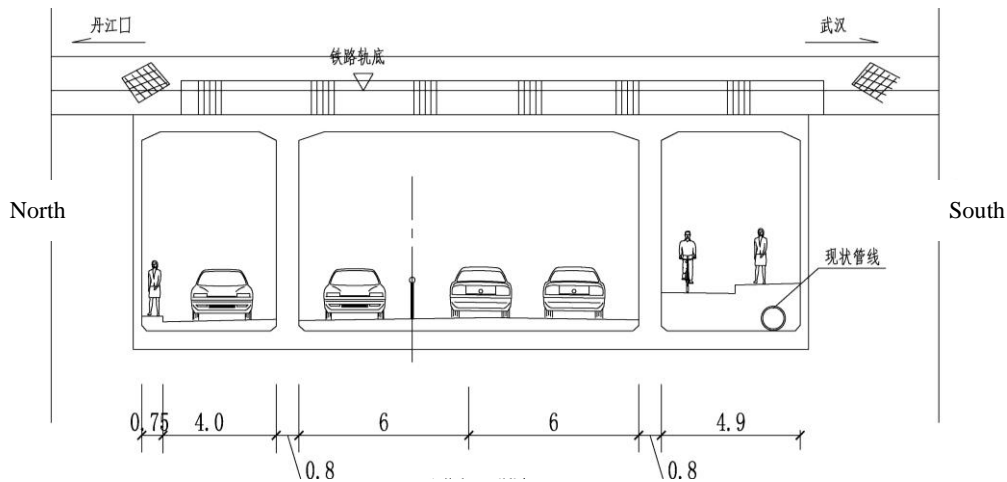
Reconstructed Cross Section of Culvert in Handan Railway
